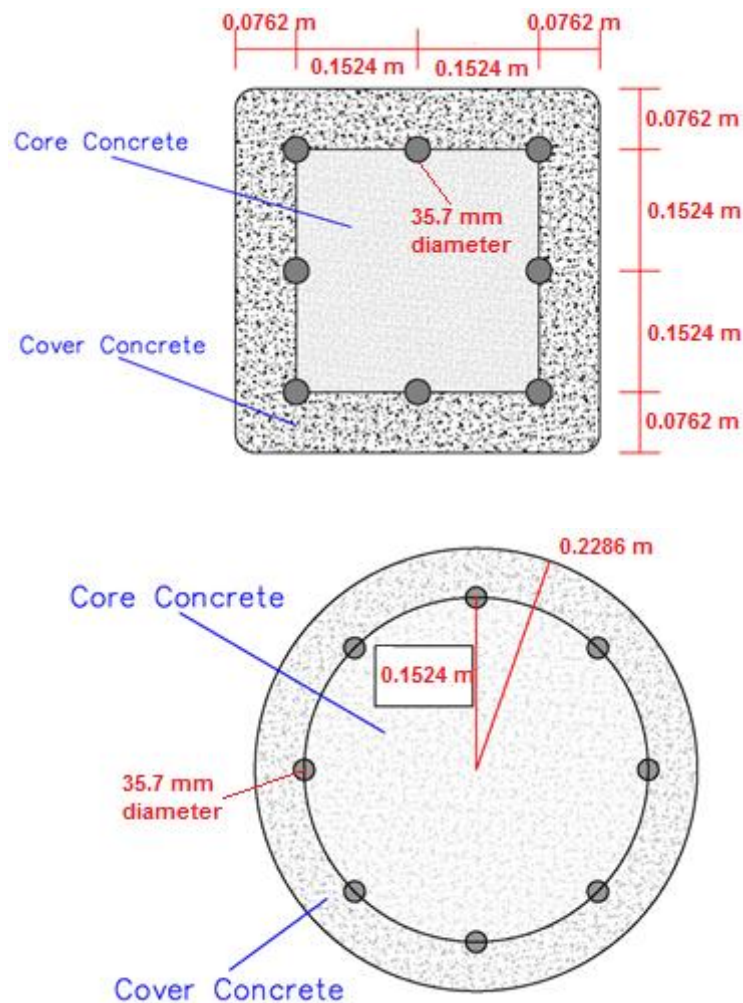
Reinforced concrete pile cross sections tested with base wharf model for (a) square pile and (b) circular pile
